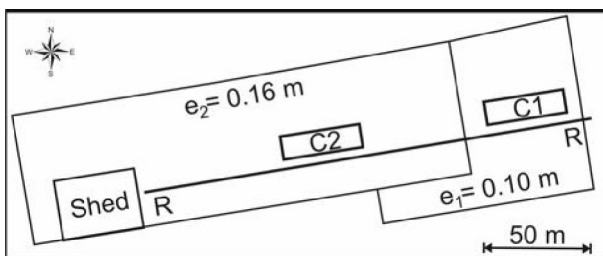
Schematic drawing of the fixed-offset profile R and two CMP profiles, C1 and C2, done on a concrete floor with two thicknesses $e_1 = 0.1$ m and $e_2 = 0.16$ m. Profile R begins right beside a storage shed.
